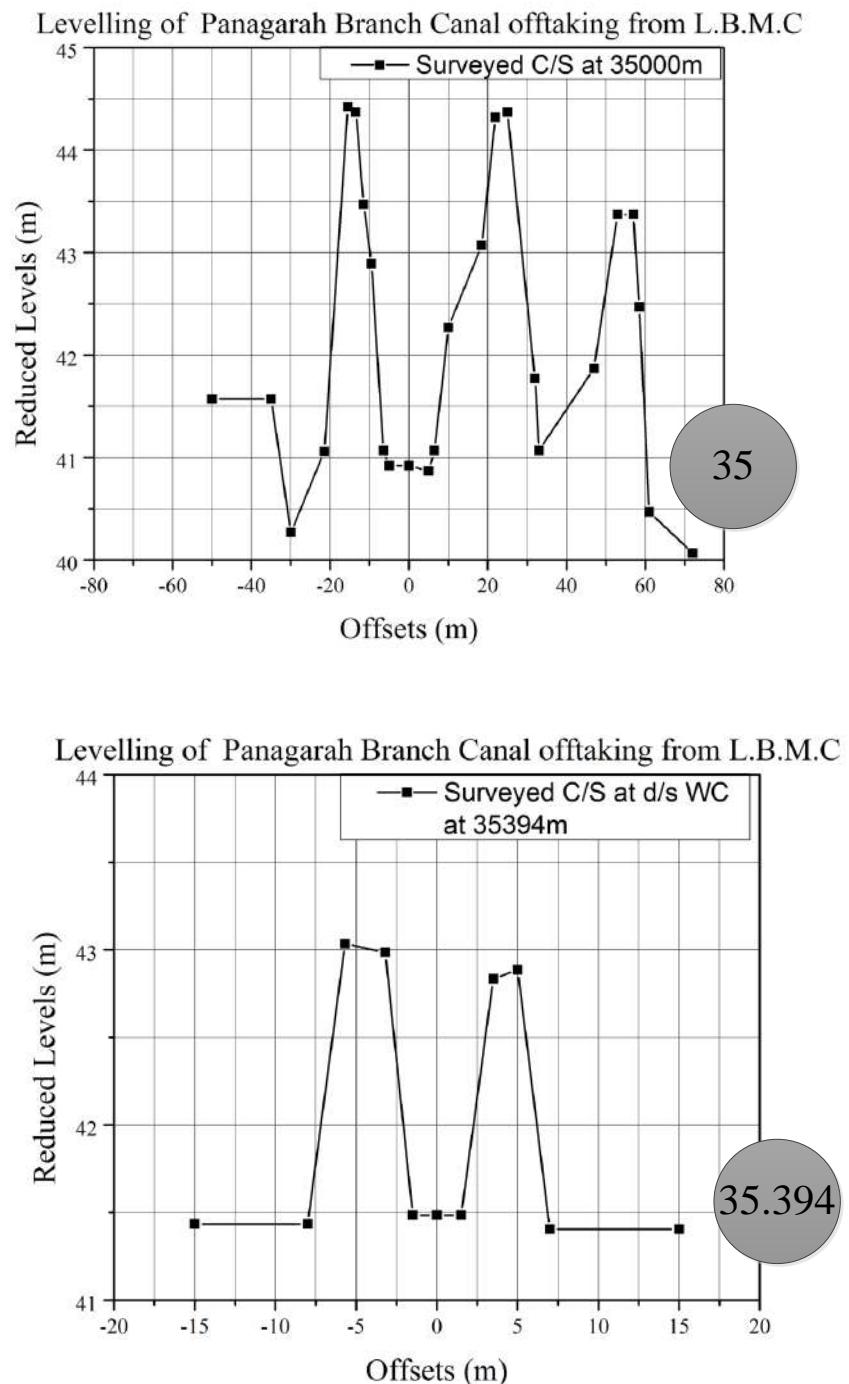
Canal cross section from 33 km to 35 km on Panagarah branch canal
